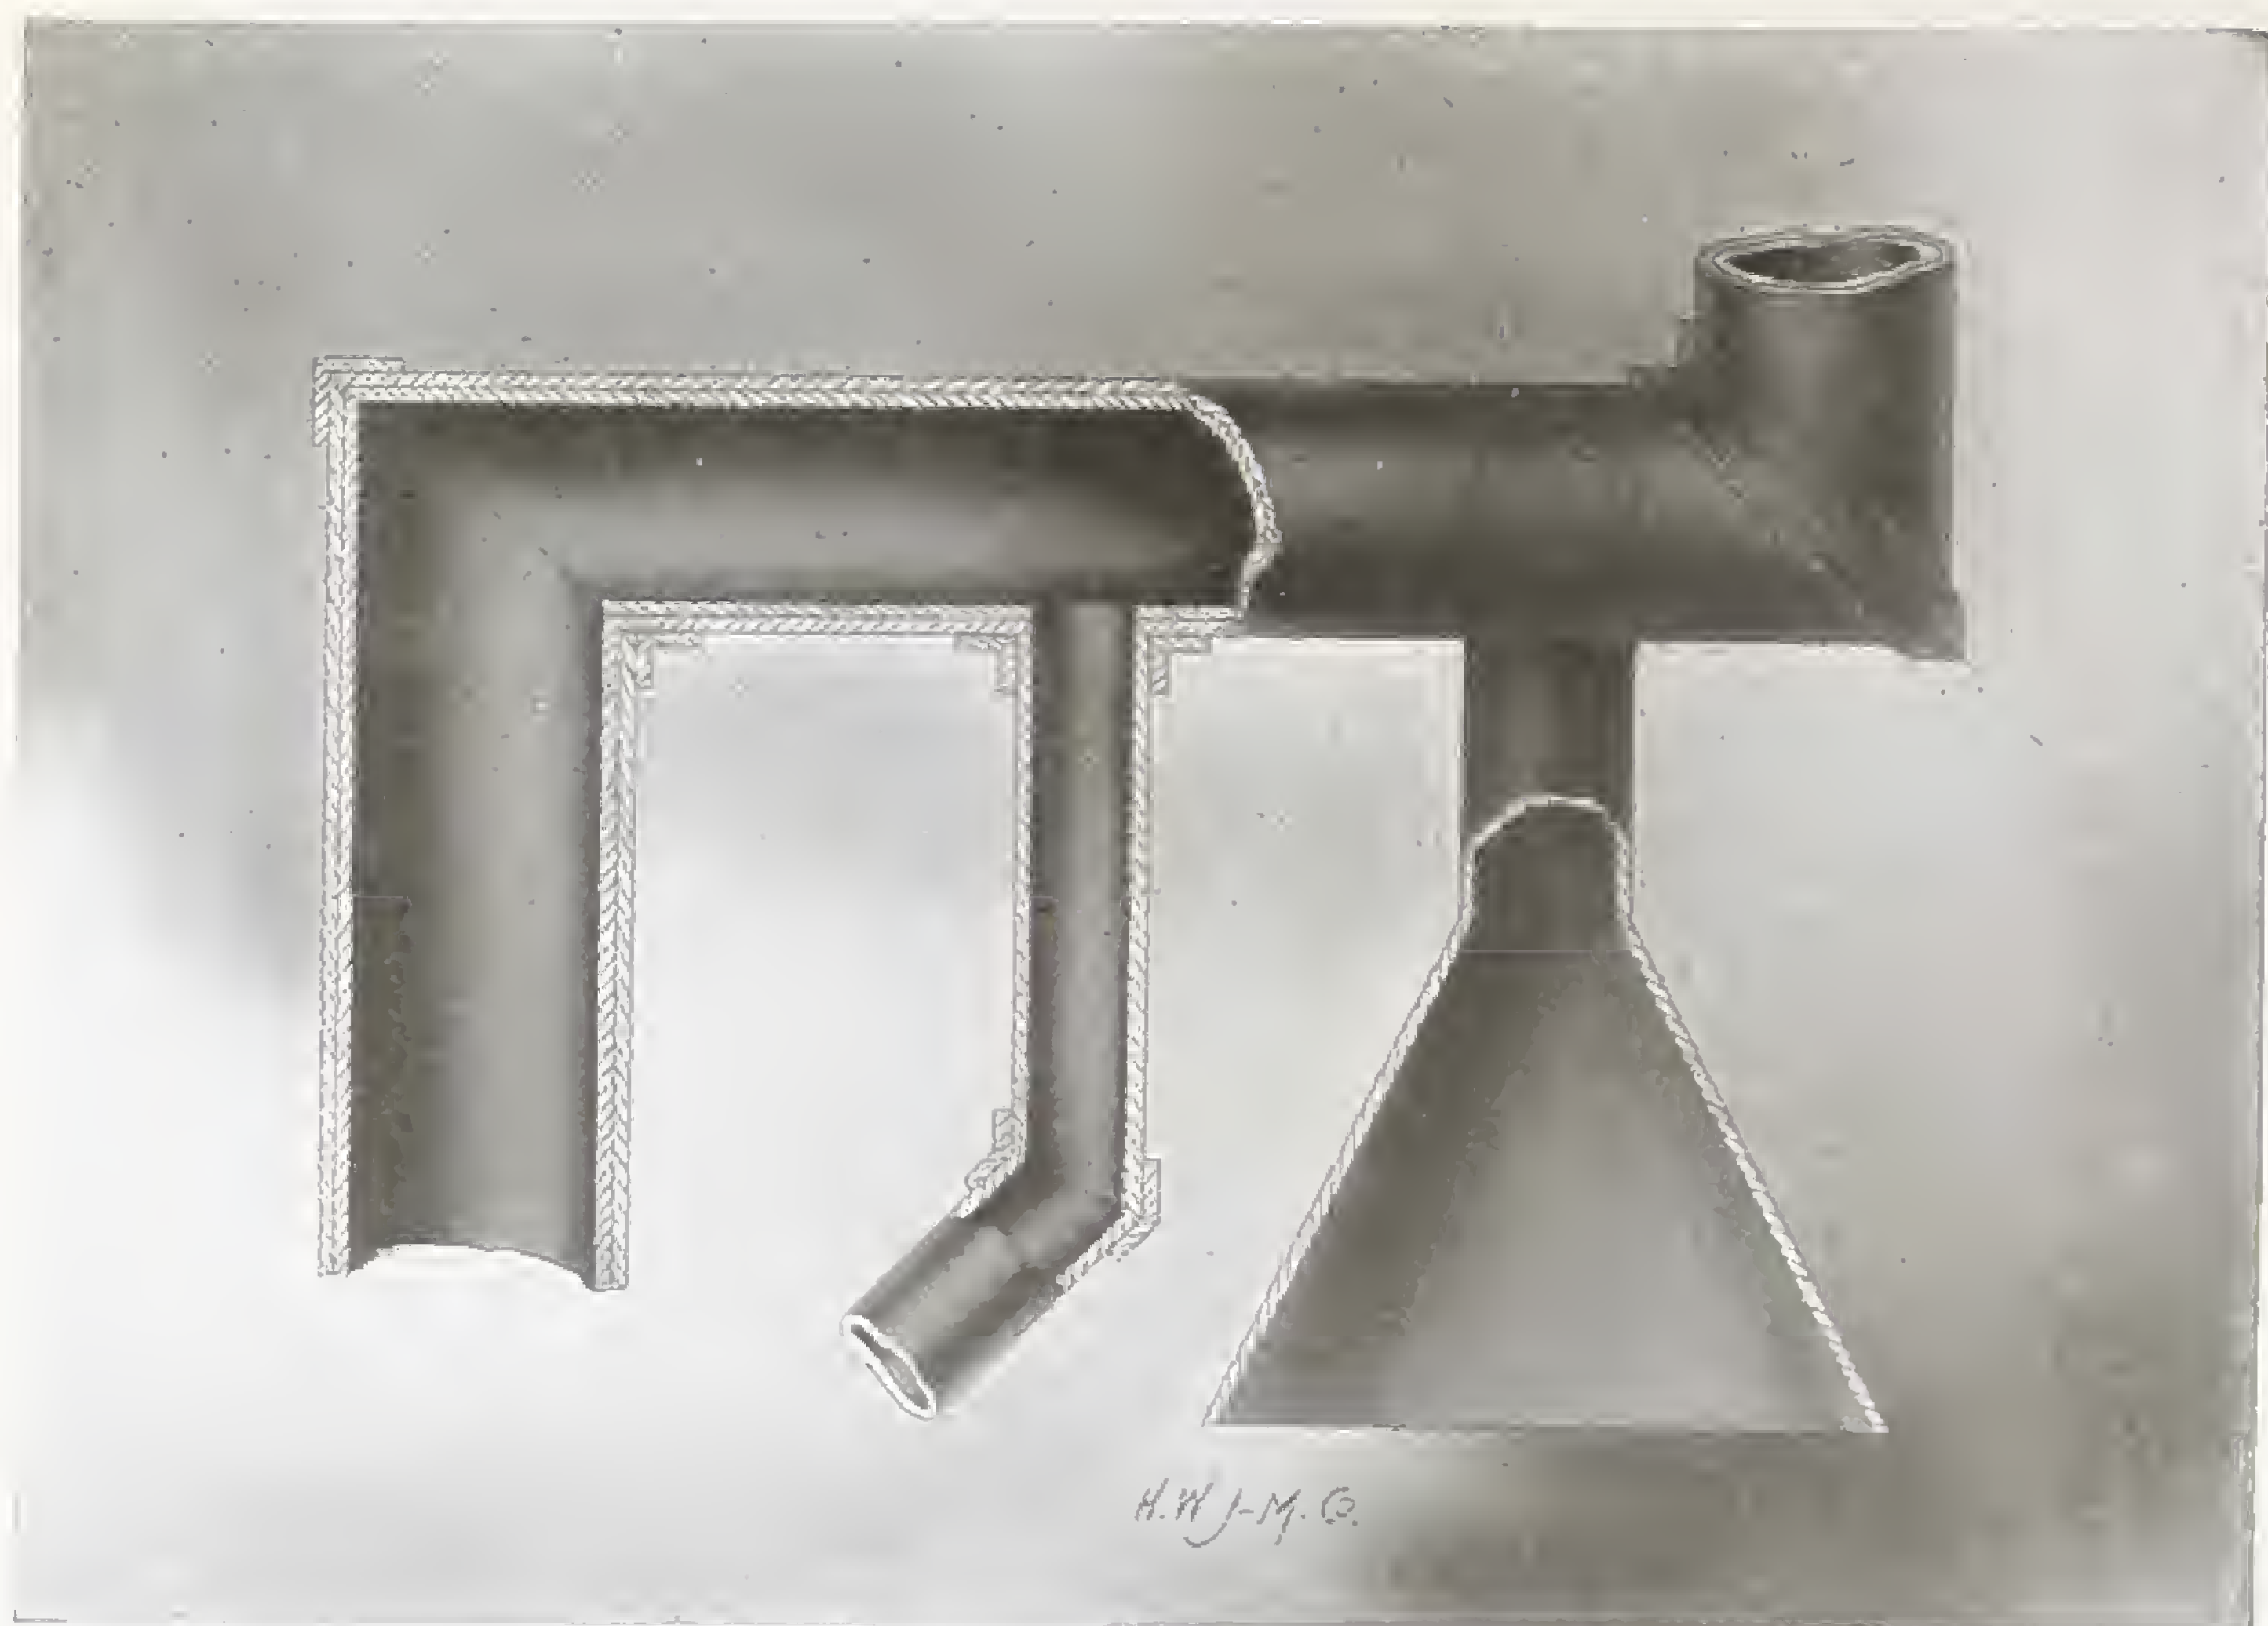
Sectional view of lining, showing angles, lugs, and bolts.
